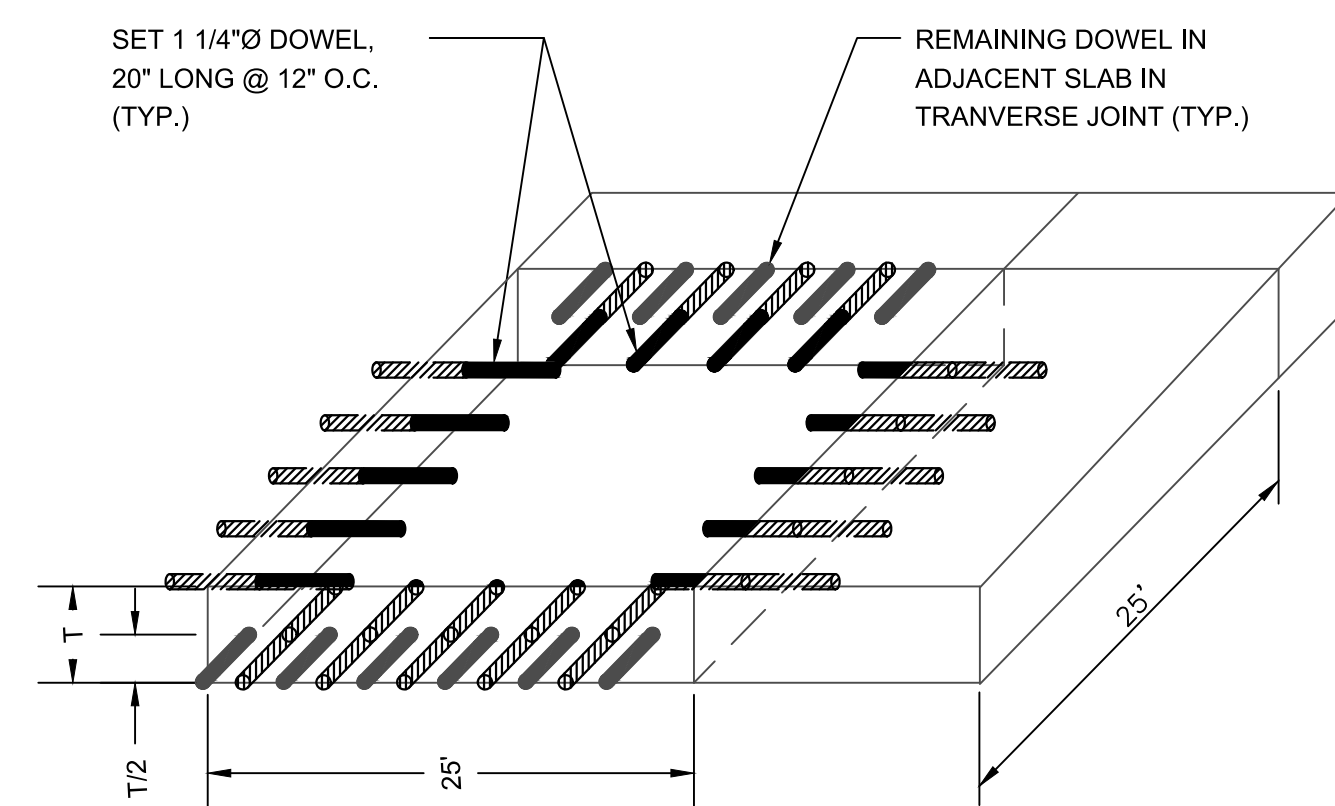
B SAWCUTTING EXISTING HALF OR QUARTER SLAB
